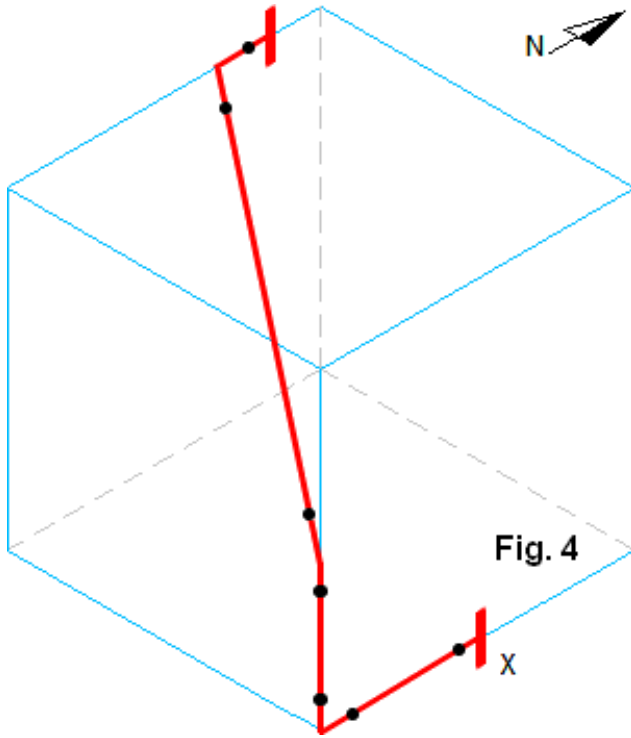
shows a pipe that runs through three planes, from one plane to a opposite plane.
